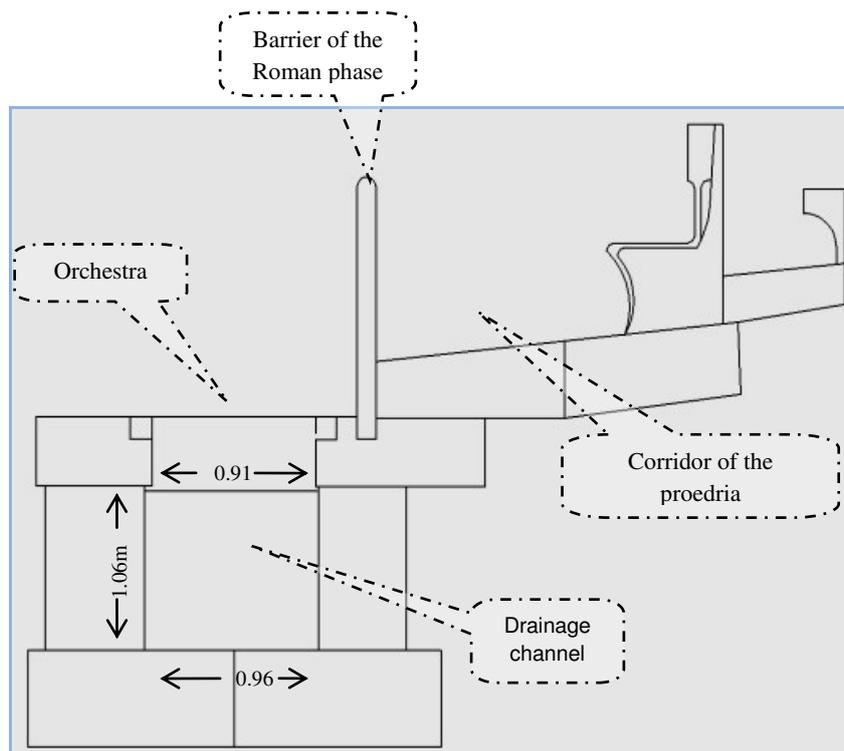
Dionysus' theatre: cross section of the drainage channel and its surroundings (arranged by K. Kollyropoulos on a base drawing adapted from Döperfeld's plans, 1896)
